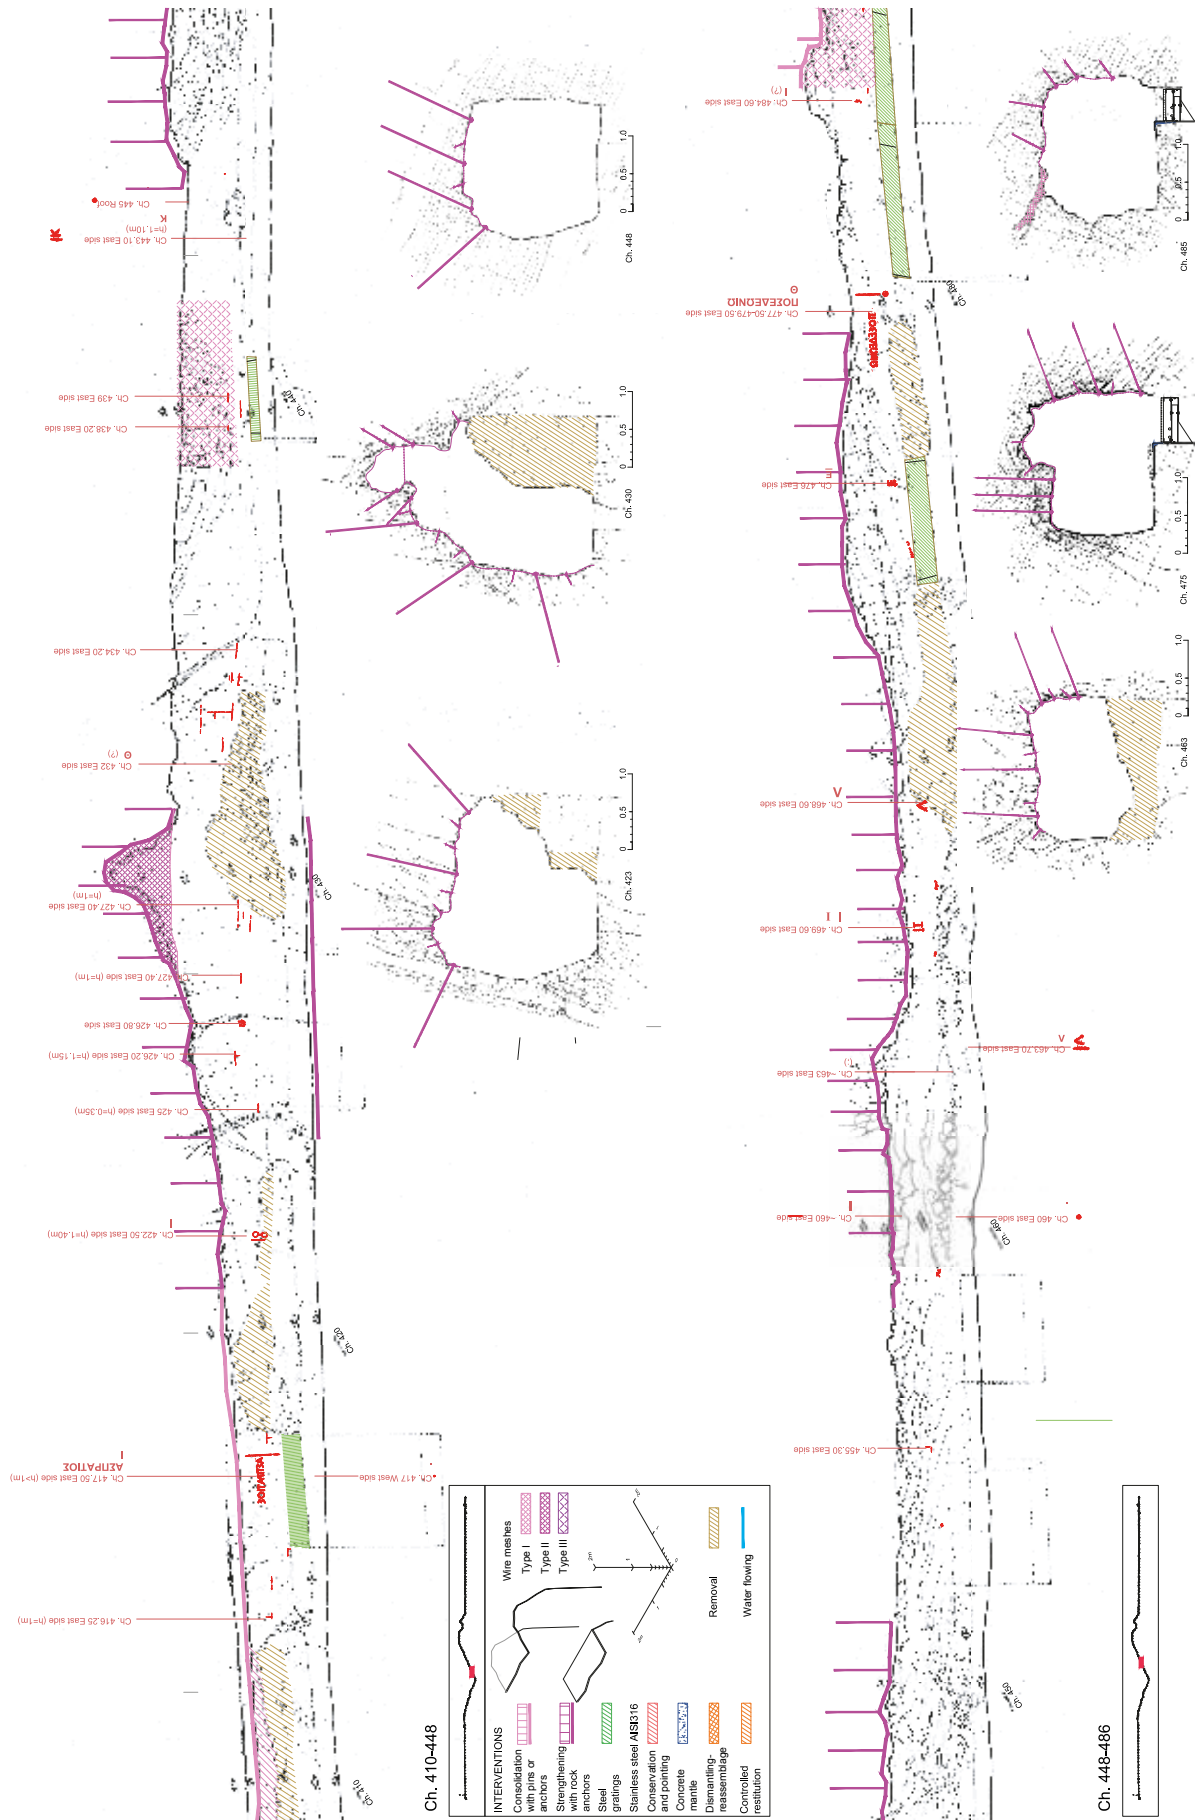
Isometric plan of the tunnel of Eupalinos (scale 1 : 200) with sections (scale 1 : 100), Ch. 410–486
